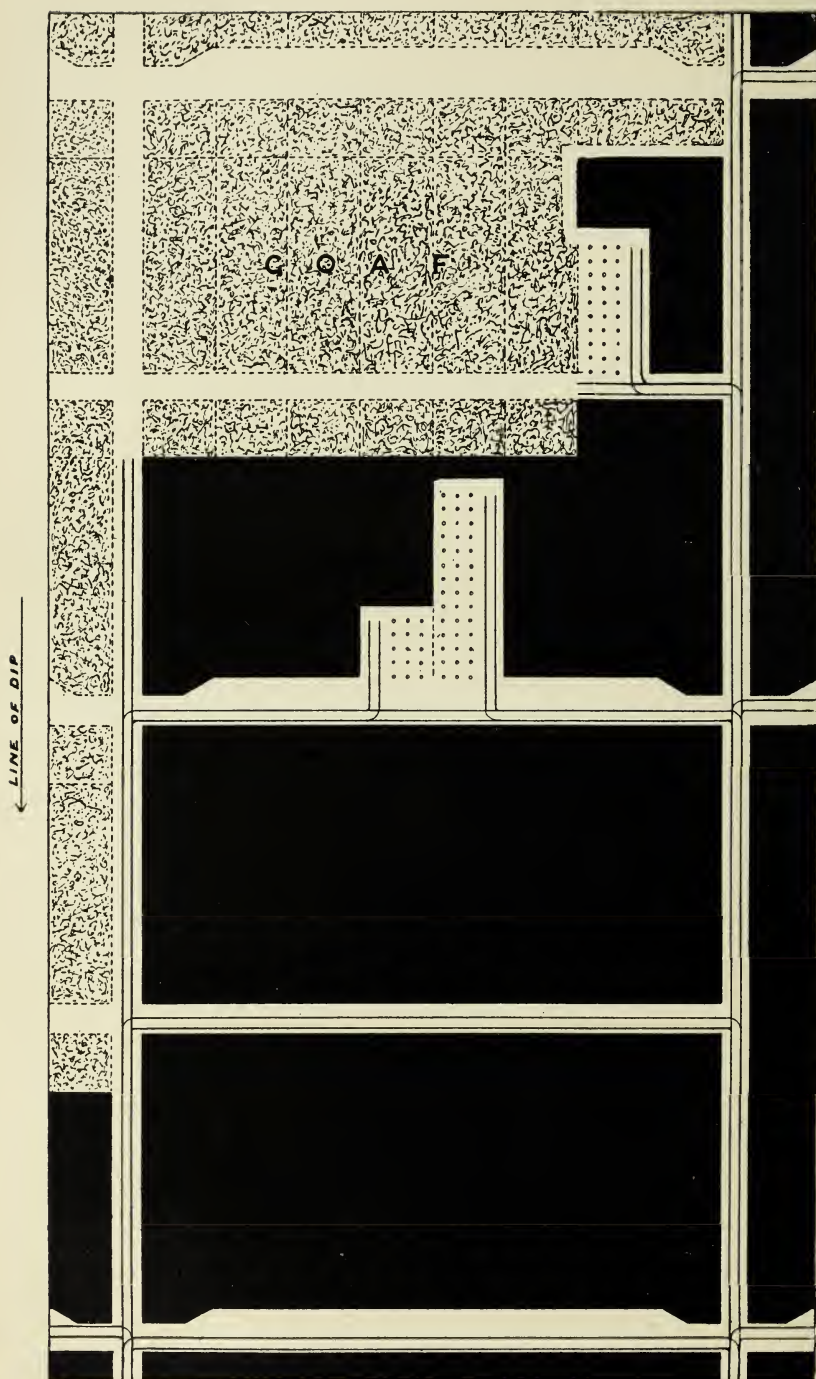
SILKSORTH COLLIERY, NEAR SUNDERLAND, SOUTH DURHAM. PLAN SHOWING THE USUAL METHOD OF PILLAR WORKING IN THE MAUDLIN SEAM.
